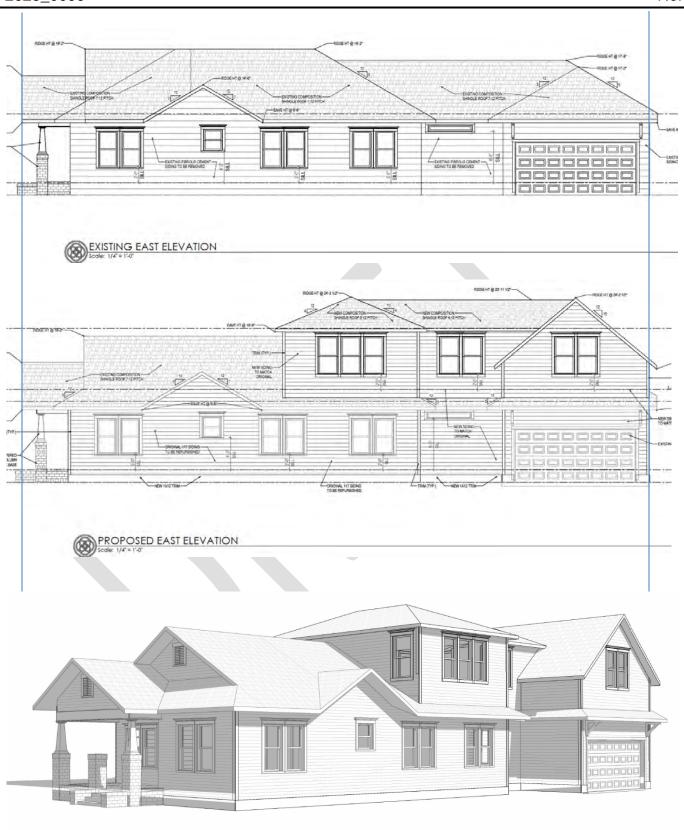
Shadow Study Showing Current Elevation Versus Proposed
